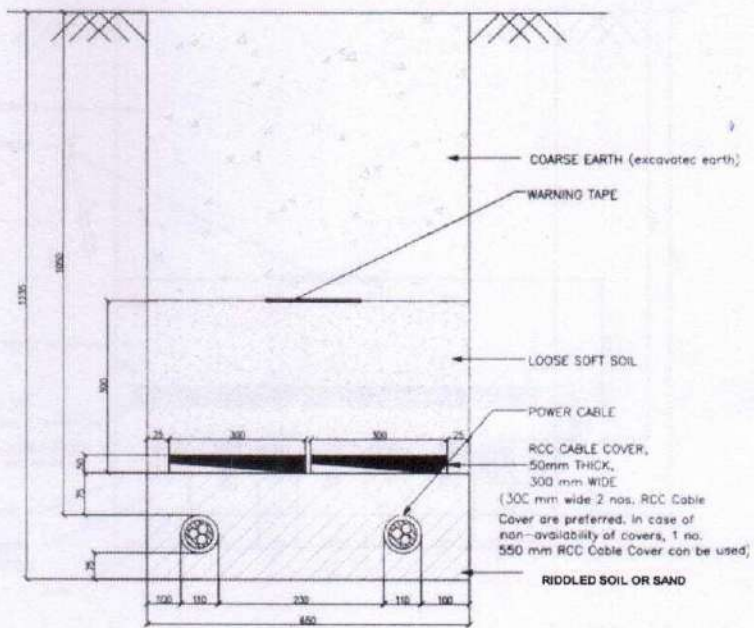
11kV Buried Cable for Double Circuit
